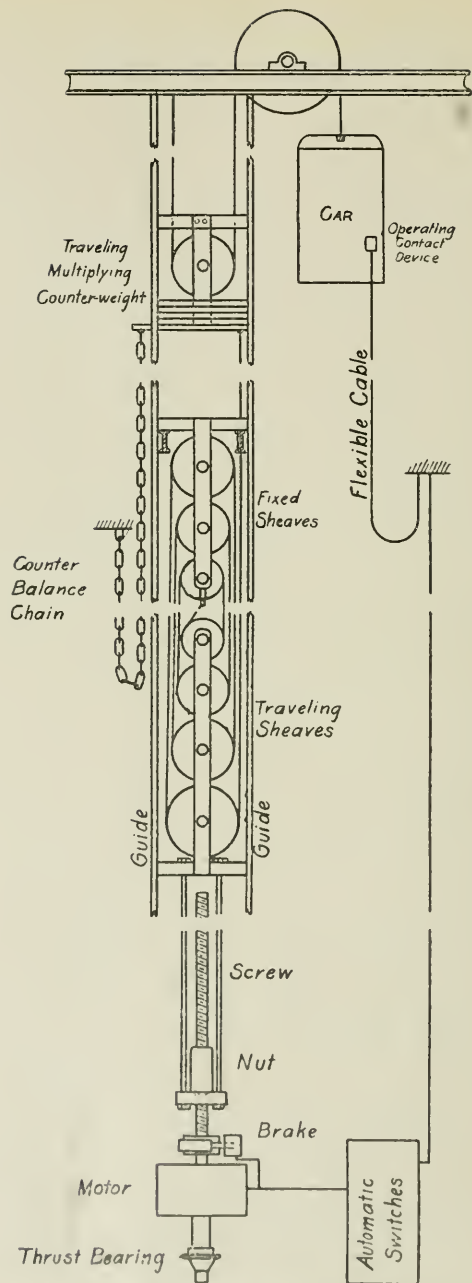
MULTIPLE SHEAVE ELECTRIC ELEVATOR.
